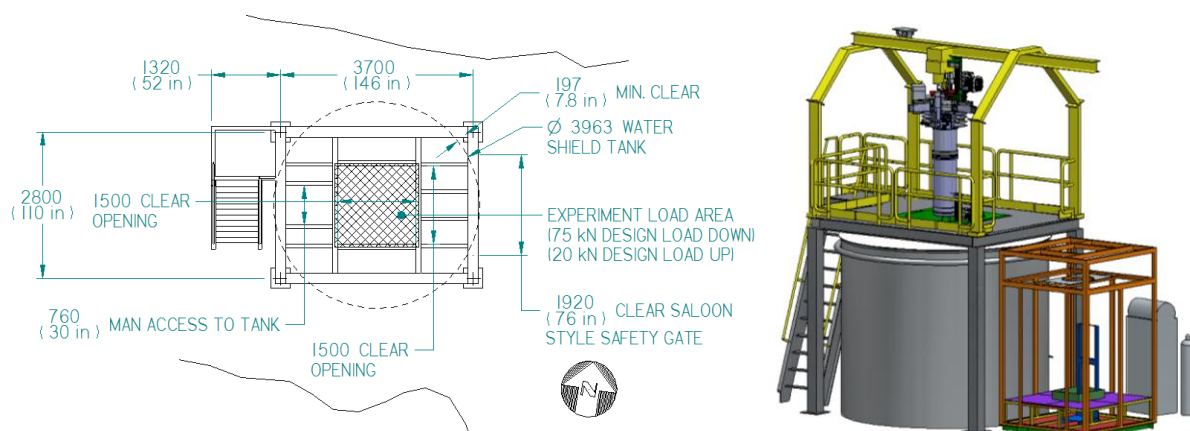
(Left) Platform plan view. (Right) Platform shown with cryostat raised.
